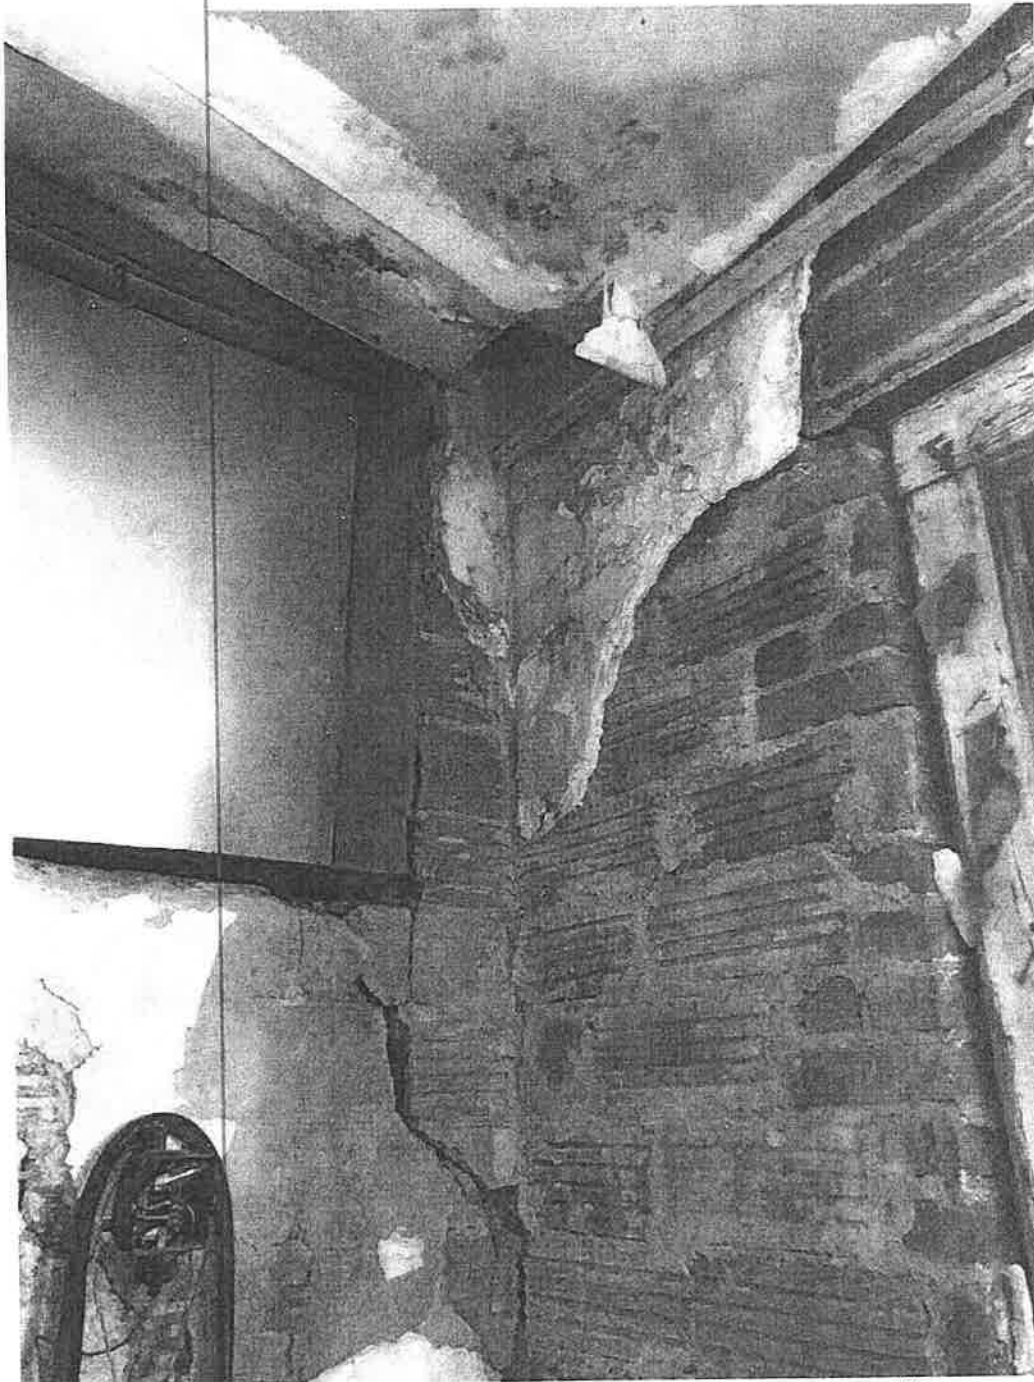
Failed plaster at structural cracking at 2nd Floor. Note mold growth at ceiling area previously patched with gypsum board.
